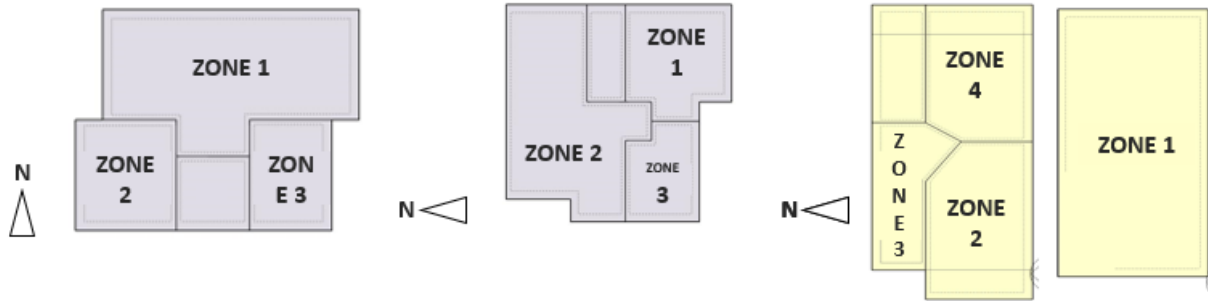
15. C1 zoning plan, C2 zoning plan, and C3 zoning plan from left to right
